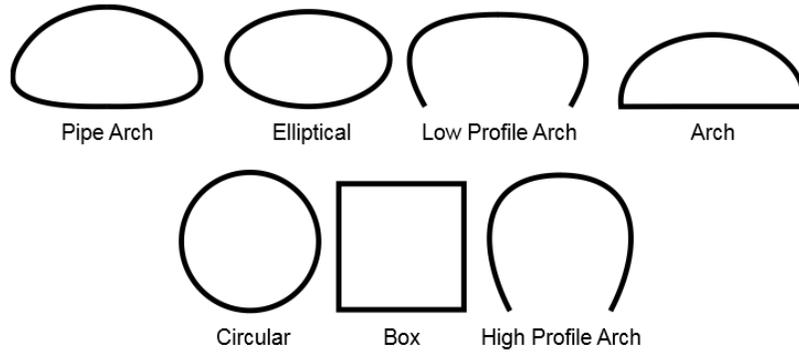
Common Shapes (Note that arch and box shapes may be 3-sided, supported by footings)
